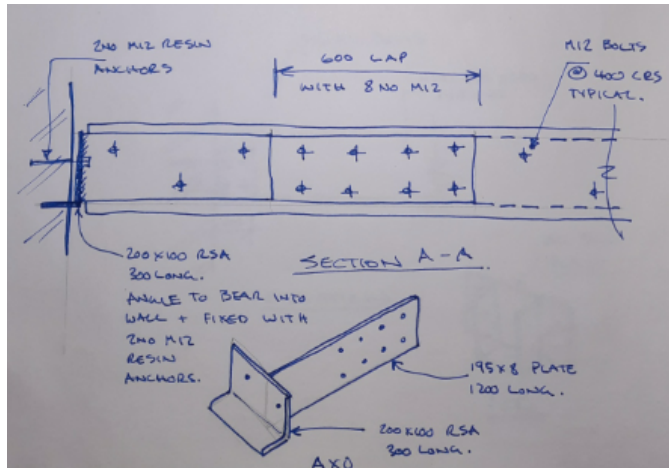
The Morton Partnership: plate reinforcement plan and end detail with integral bearing plates
